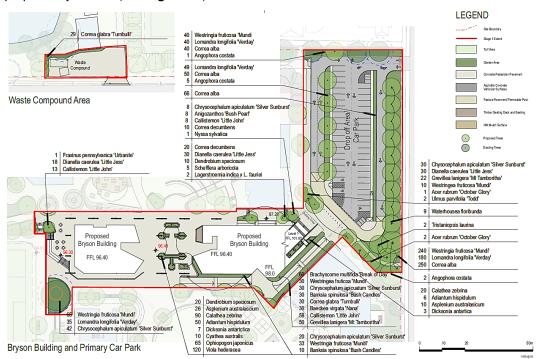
Extract from Stage 1 Landscape Ground Level plan (Source: Arterra)
